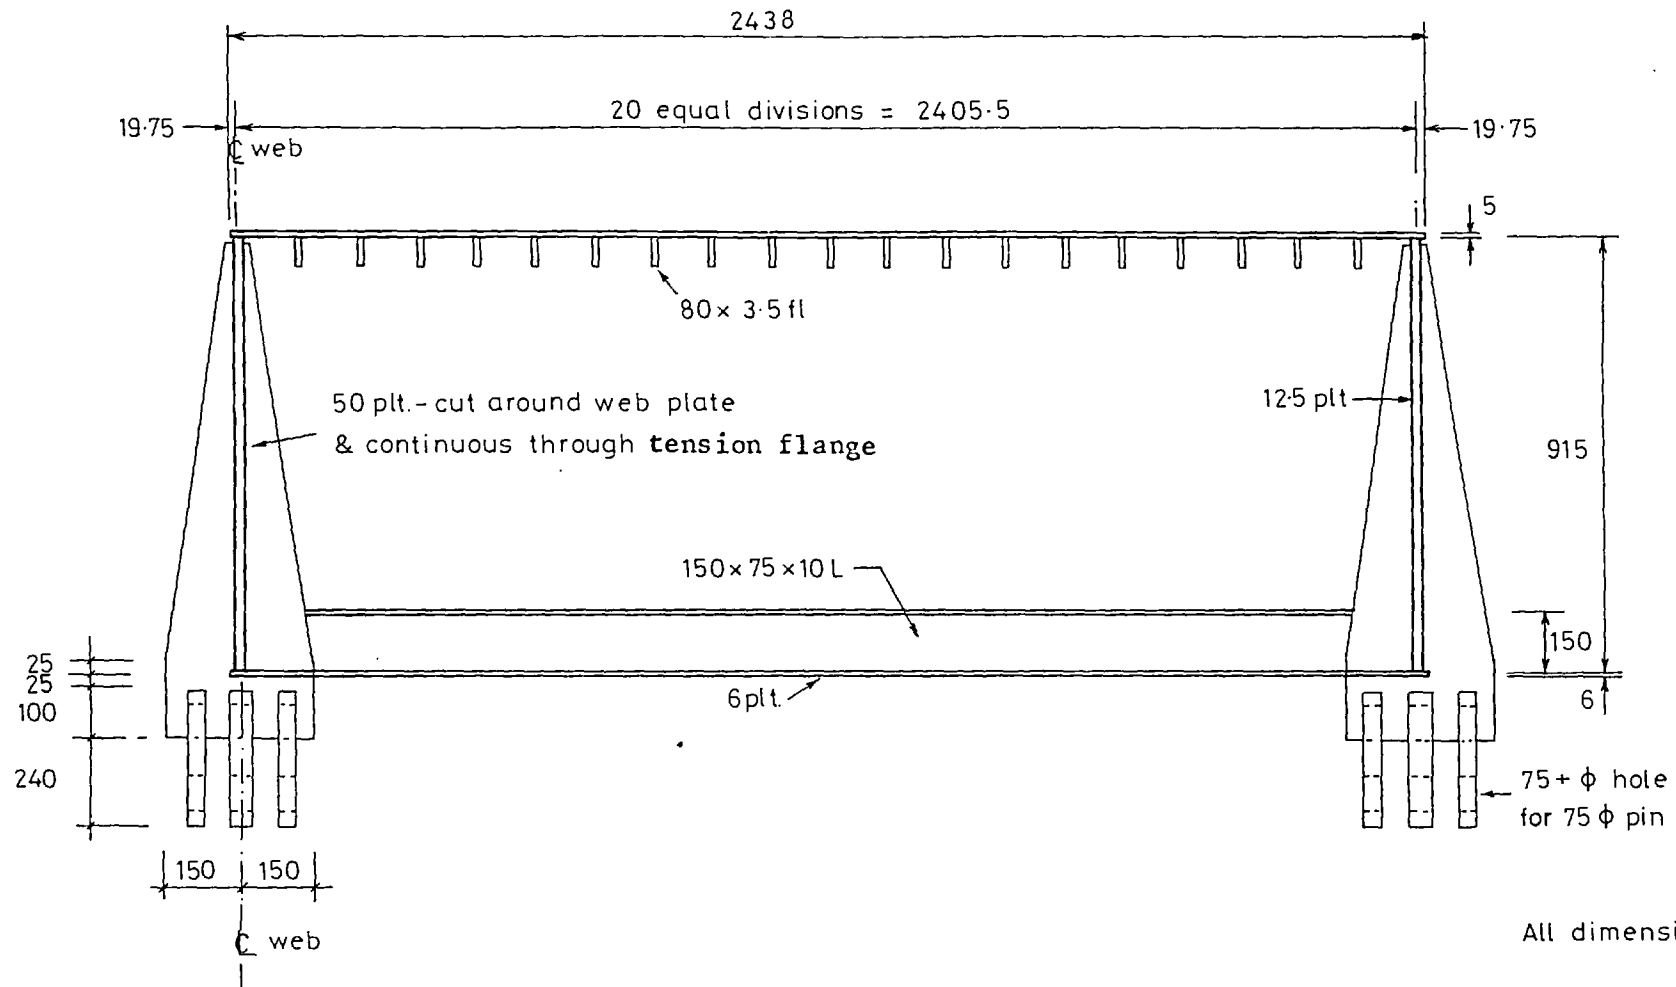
Model 12: Cross-section and Details of Loading Lugs
